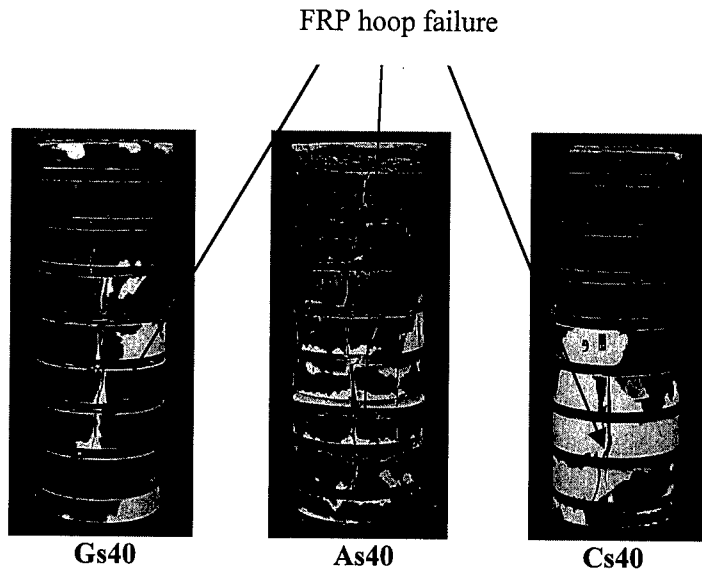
Typical Failure Mode of PVC-FRP Confined Concrete Specimens
